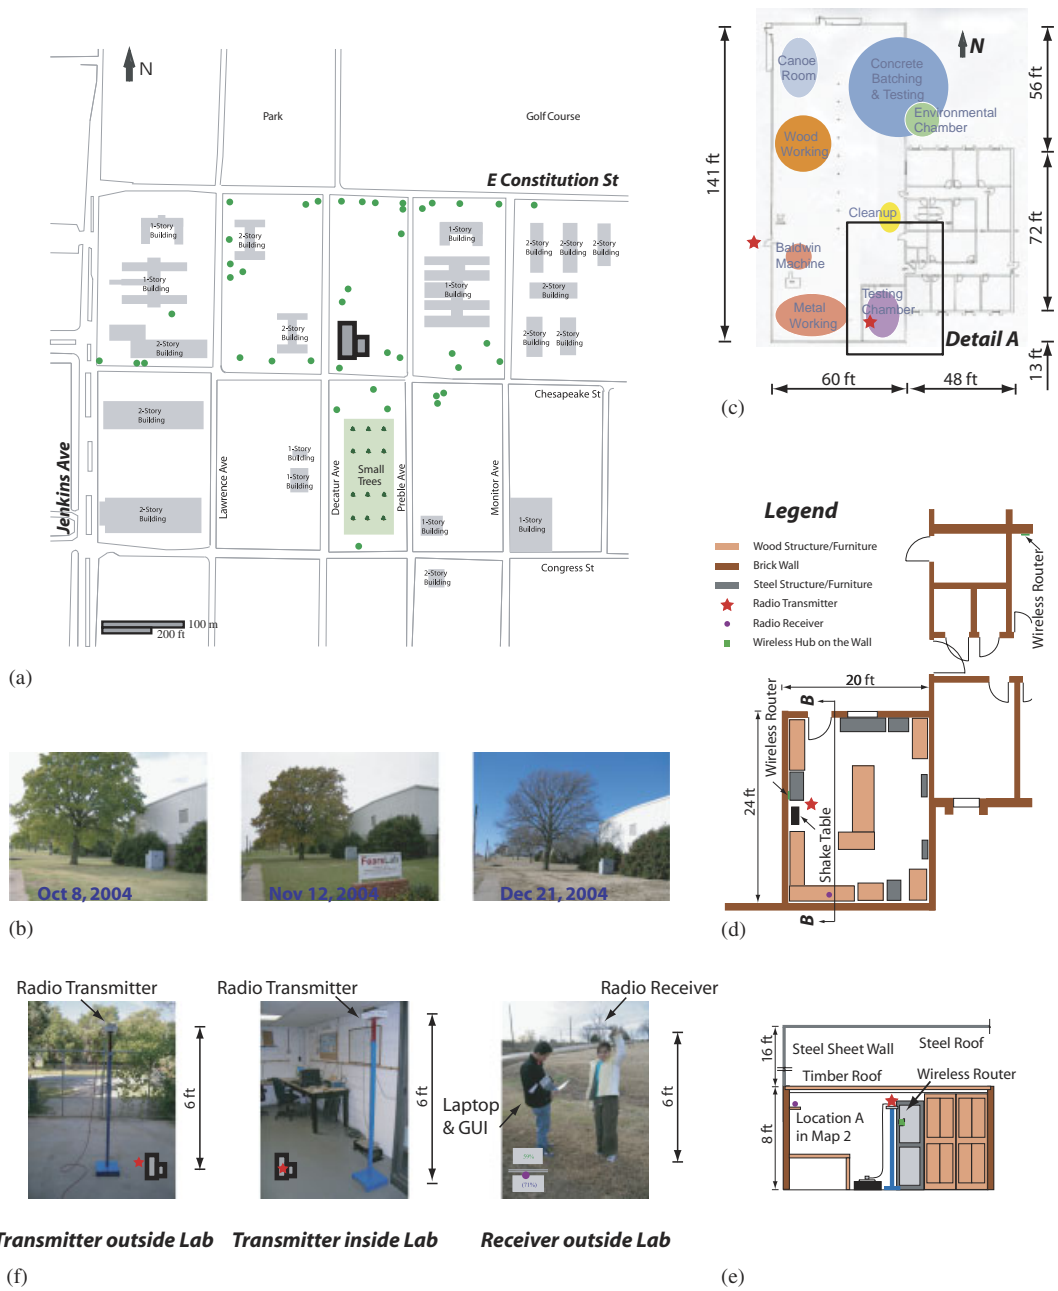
Details of the laboratory building and information on how signals were transmitted and collected: (a) location of Fears lab; (b) changing foliage condition; (c) plan view of Fears lab; (d) Detail A—plan view of testing chamber; (e) Section B–B—testing chamber; and (f) setup of transmitter and receiver.
